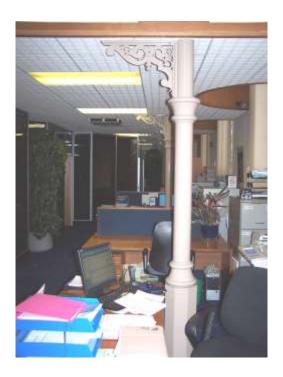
Ground Floor showing Victorian Pattern Cast Iron Columns and Beams
